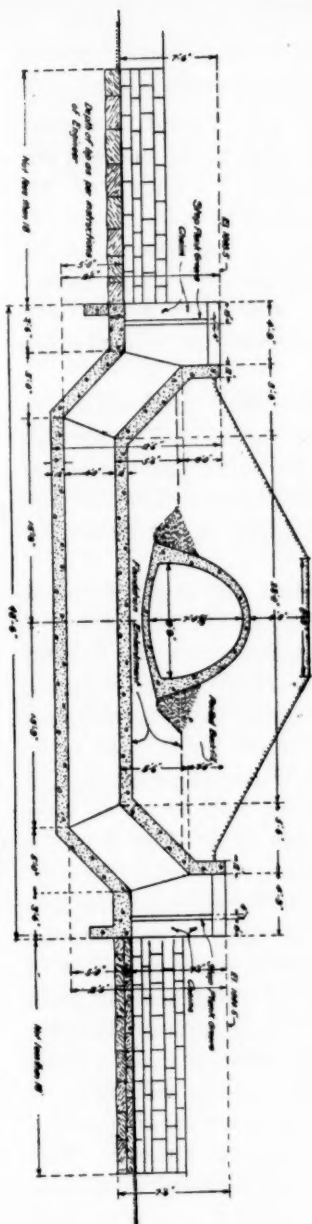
SECTION THROUGH CULVERT AT STATION 2399 + 85
